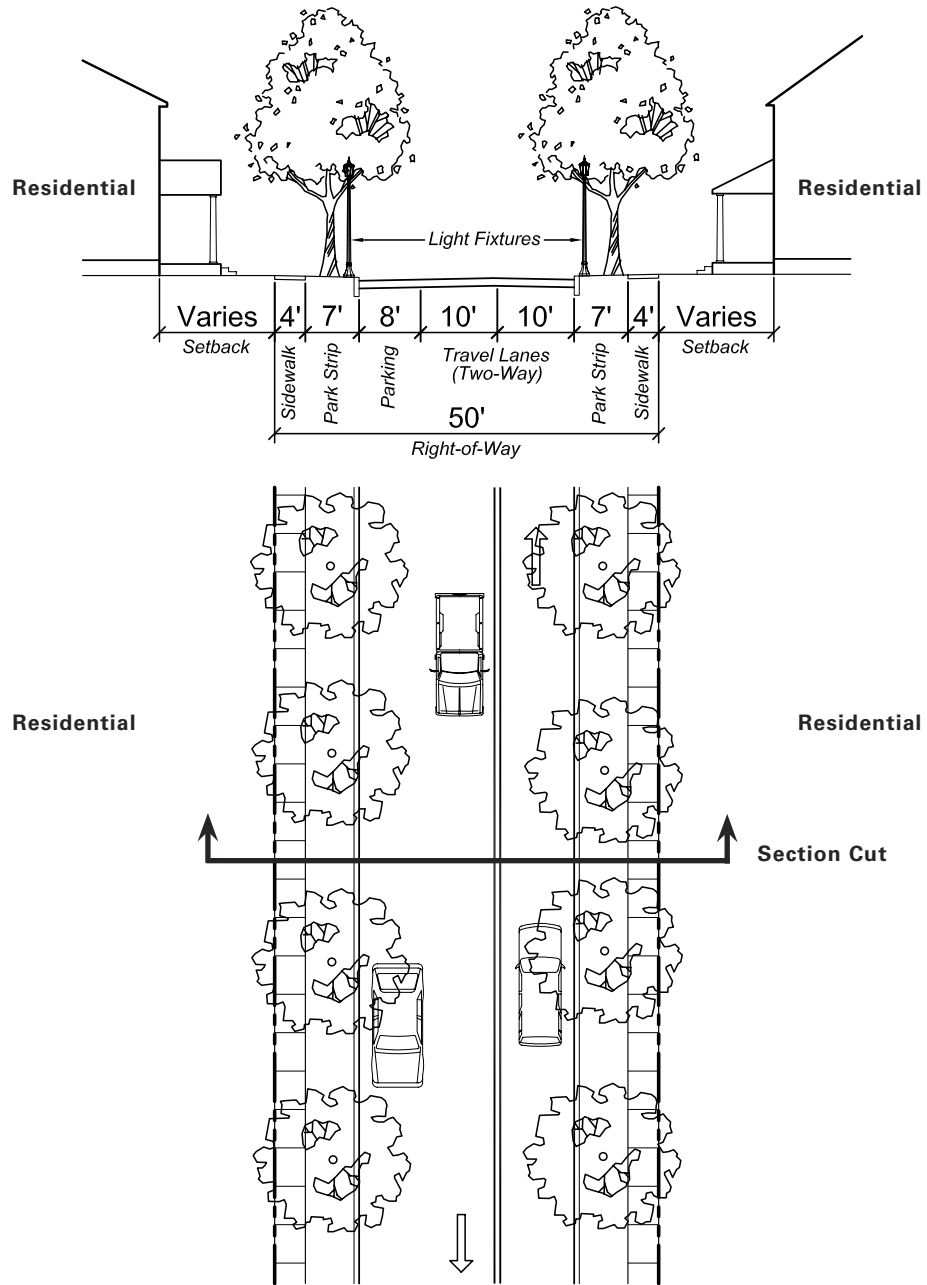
Proposed Section and Plan: Neighborhood Street B
